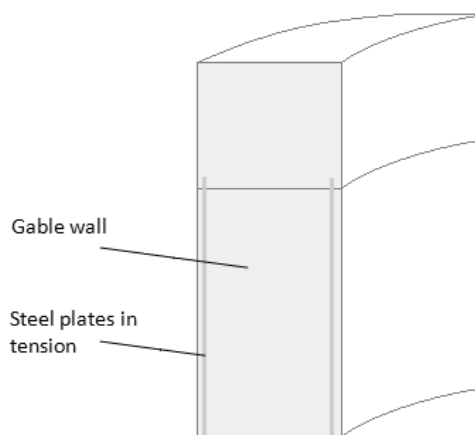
, Simplified sketch of the reinforced bracing in Scandic Opalen.
